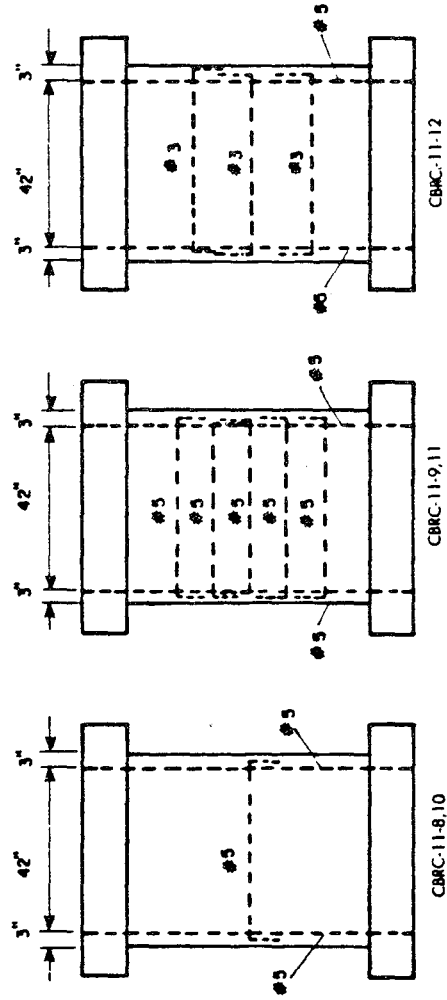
(c) REINFORCING STEEL ARRANGEMENTS FOR GROUTED CORE BRICK PIERS (CBRC)
